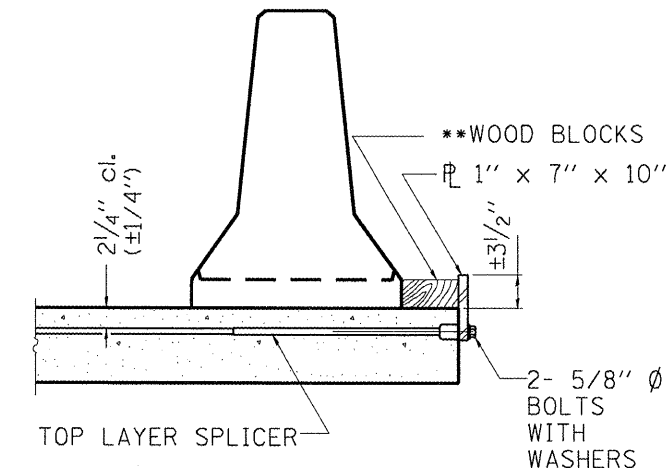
DETAIL I - WITH BAR SPLICER OR COUPLERS:
